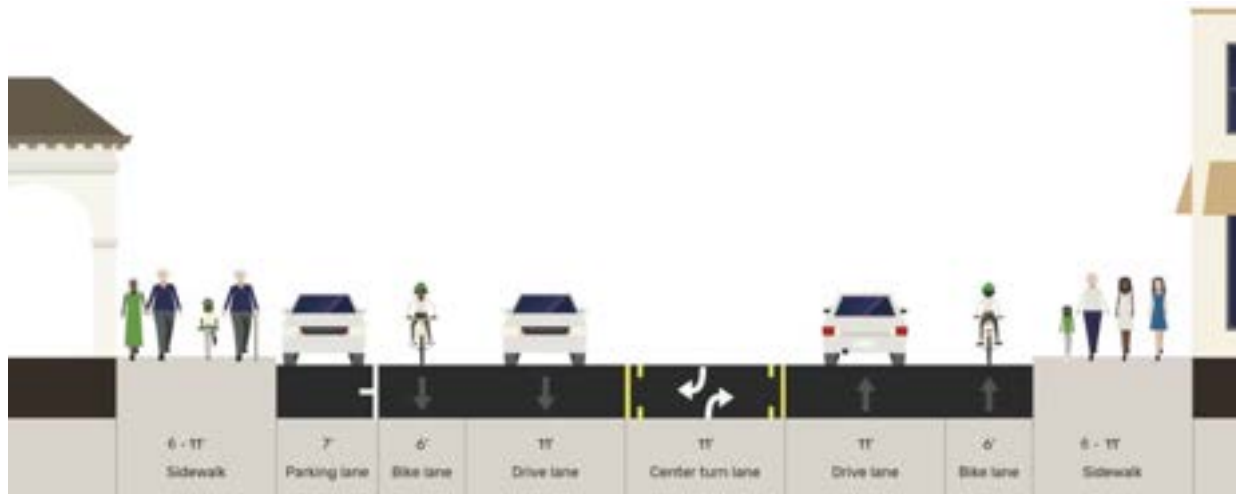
NE 3rd Street: Standard Bike Lanes and Sidewalk Infill Concept
